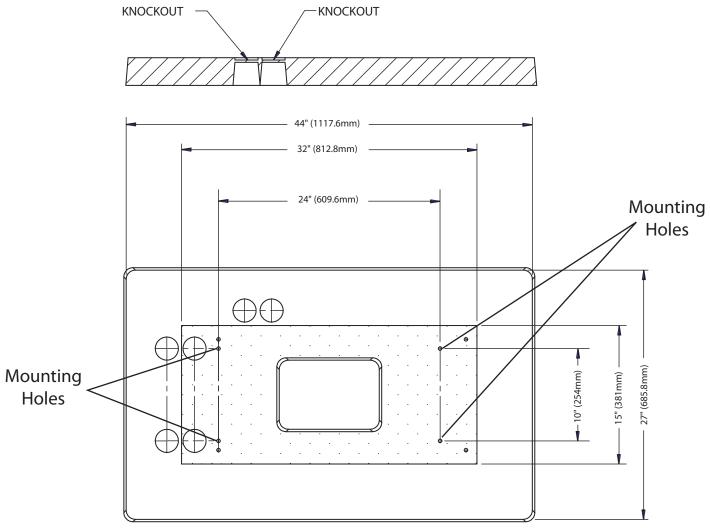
, Layout for Precast Pad, Single-wide for OBE-3, P/N 641-112-10-002
